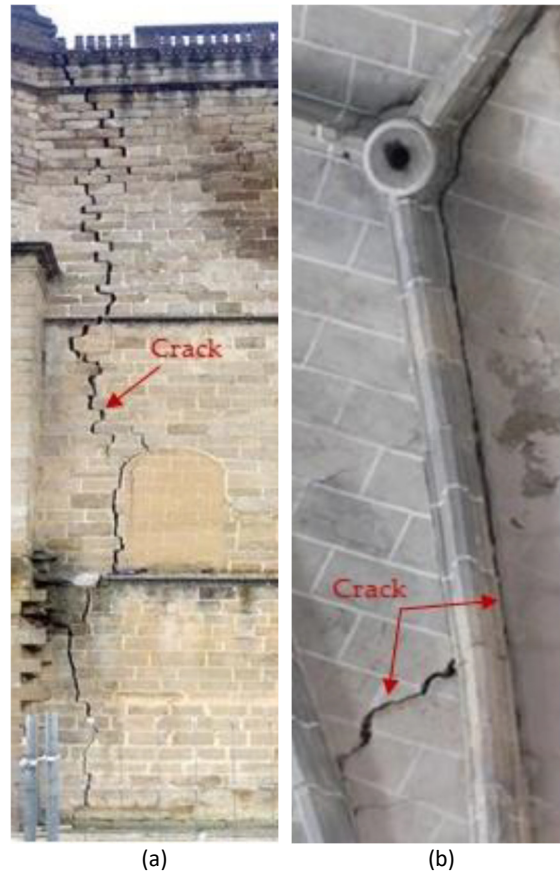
The cathedral: a) Cracks in the wall of the eastern façade; b) Cracks in the vault of the central nave.
